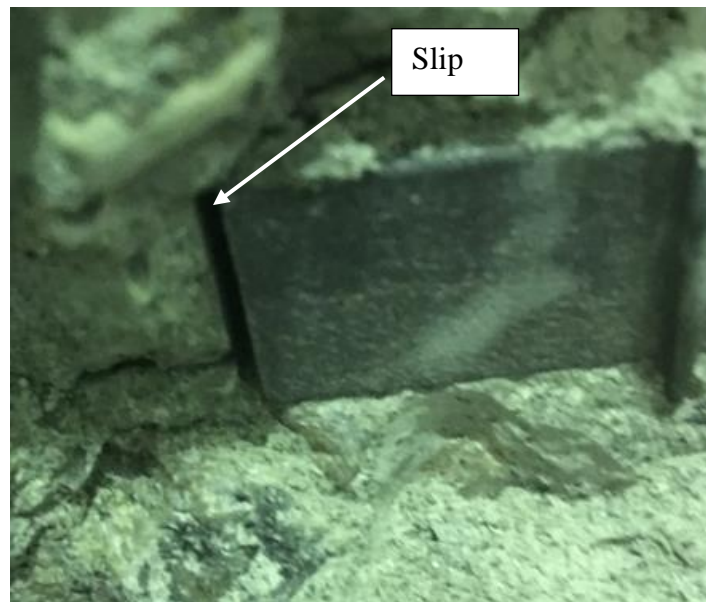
End Slip of Longitudinal Reinforcement Following Concrete Removal for Specimen 19■-410↑
